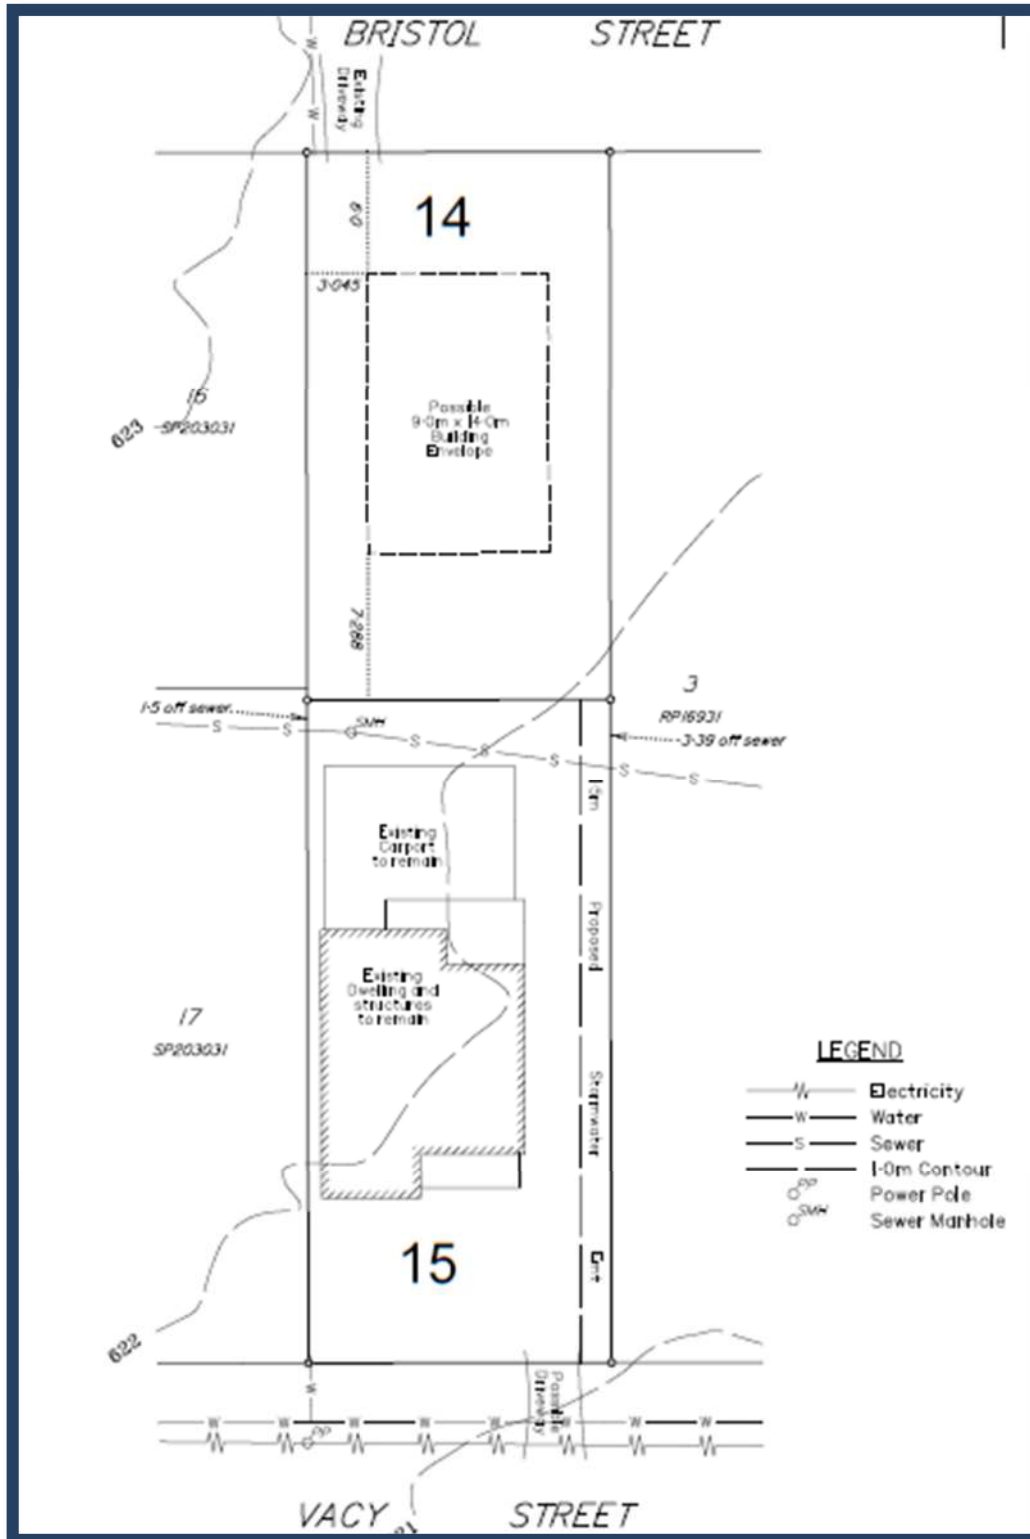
'Clean Skin' Proposed Reconfiguration Layout
